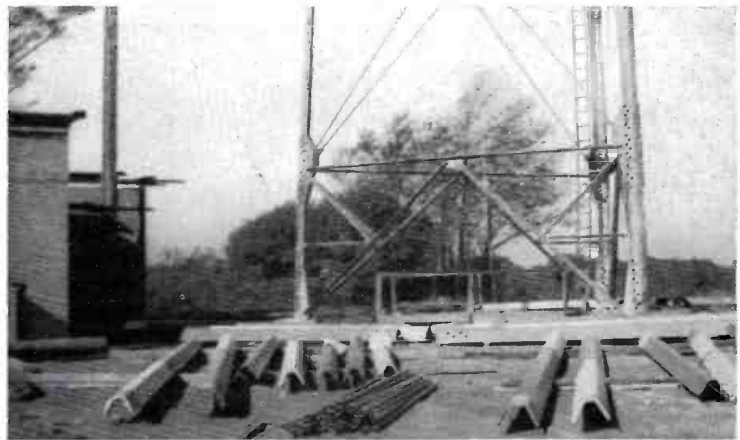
Tower construction under way. Double leg splices are used in lower section.
